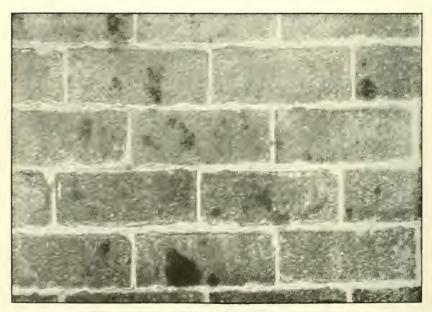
SHOWING PROPERLY FILLED GROUT JOINTS.
